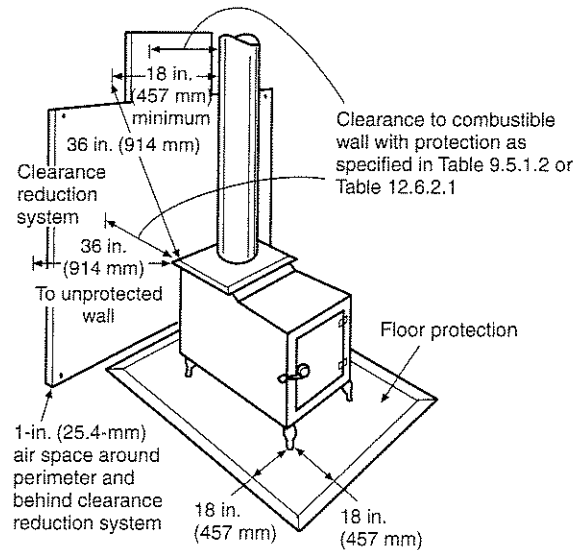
(b) Distance to Combustible Wall/Floor.
